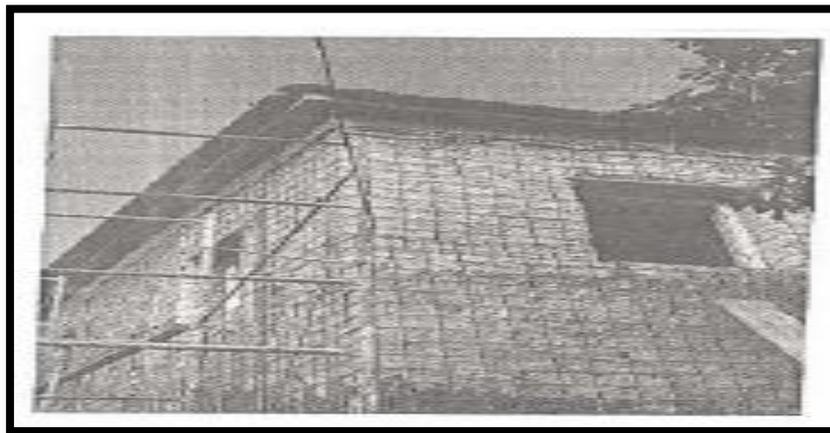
Reinforcement of old or damaged stone building using internal and external reinforcement coated with a layer of soft concrete (Hwaija, 2005)
